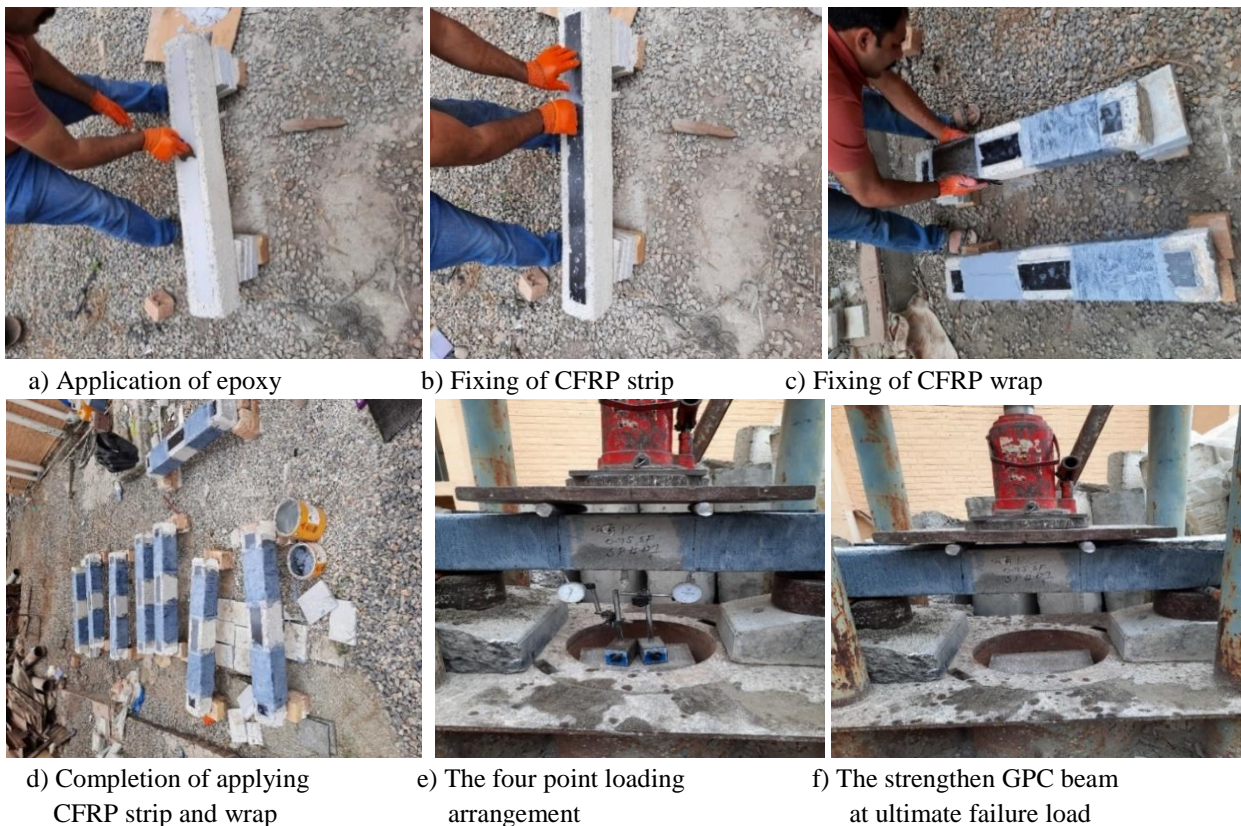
The steps followed for strengthening the GPC beams and testing arrangement
